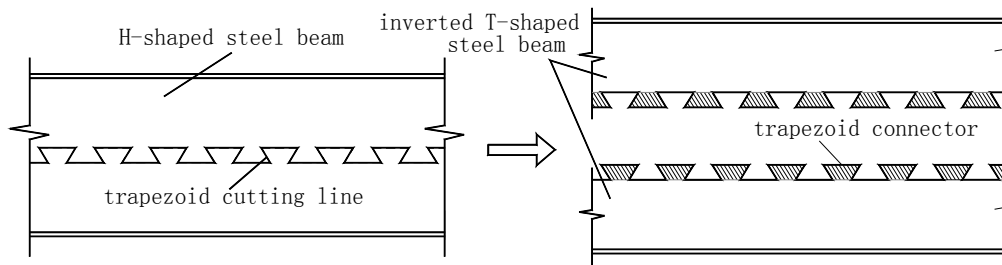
Construction Process of the Inverted T-shaped Steel Beams
